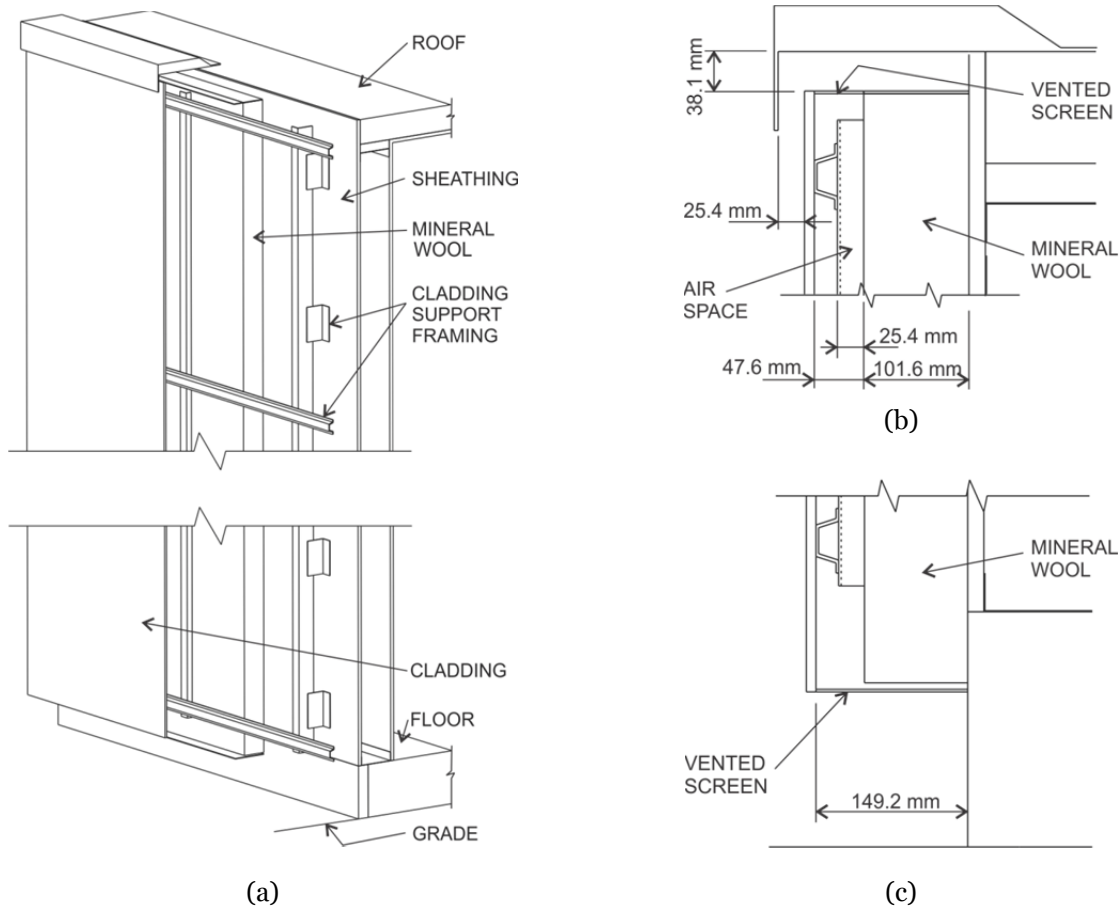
Whole-building wall assembly (a) with detail sections of top (b) and bottom (c).
